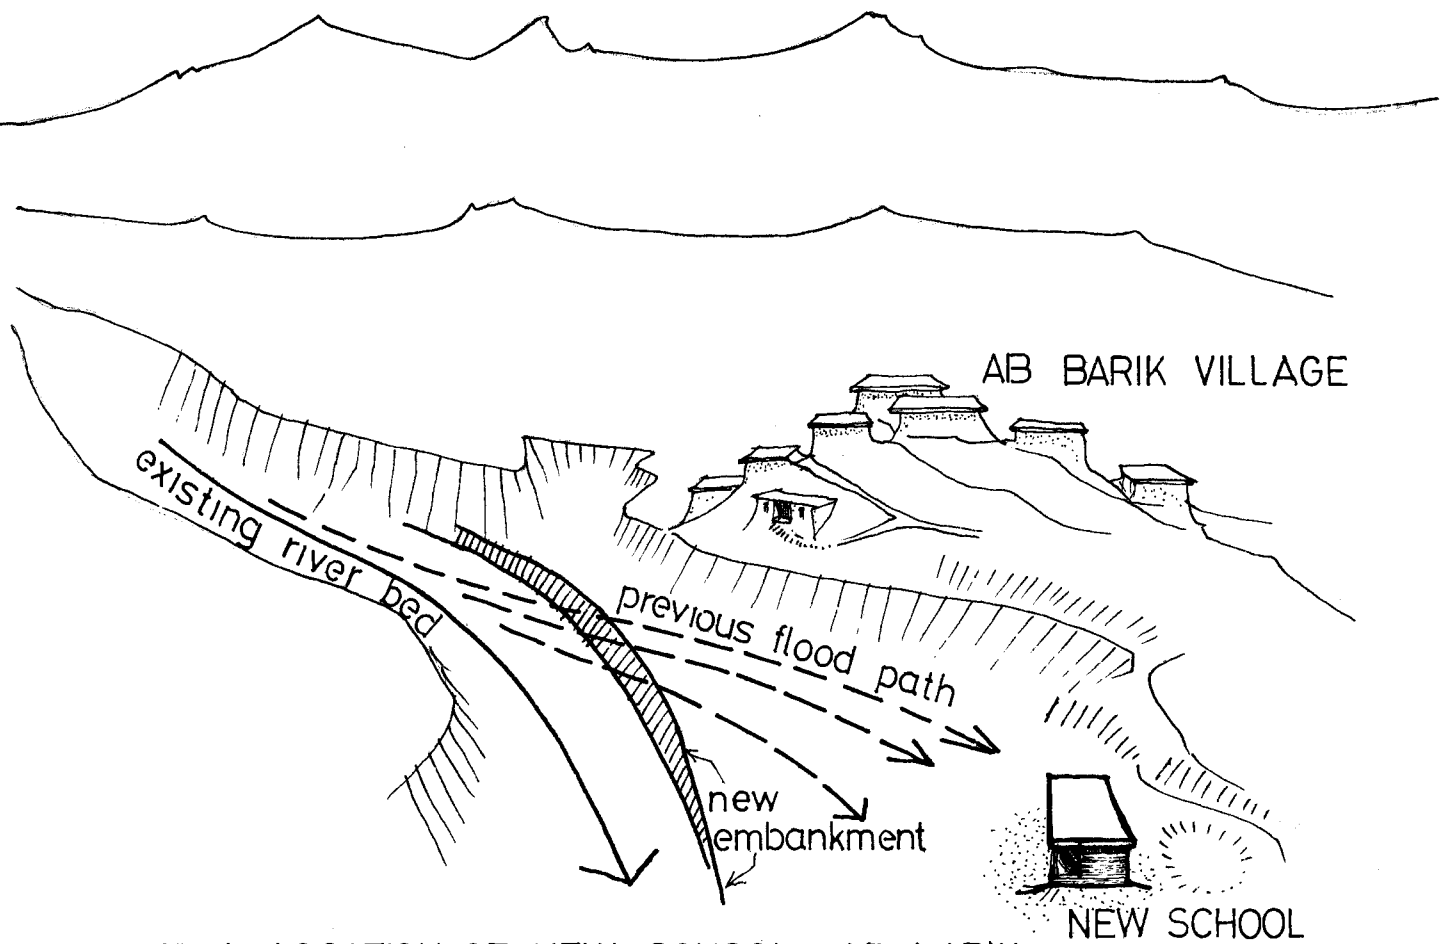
LOCATION OF NEW SCHOOL - AB BARIK
